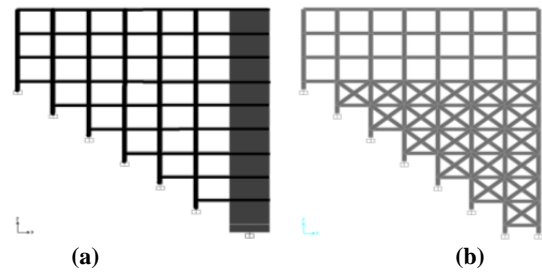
(a) Step back building with shear wall and (b) Step back building with bracing
